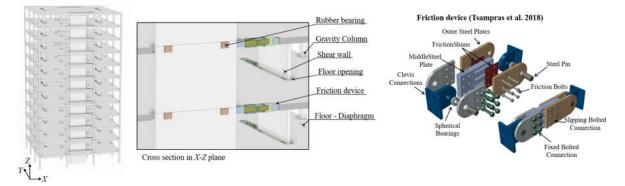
Schematic overview of building with planar shear walls and force-limiting deformable connections and schematic of friction device (Tsampras et al. 2018).
